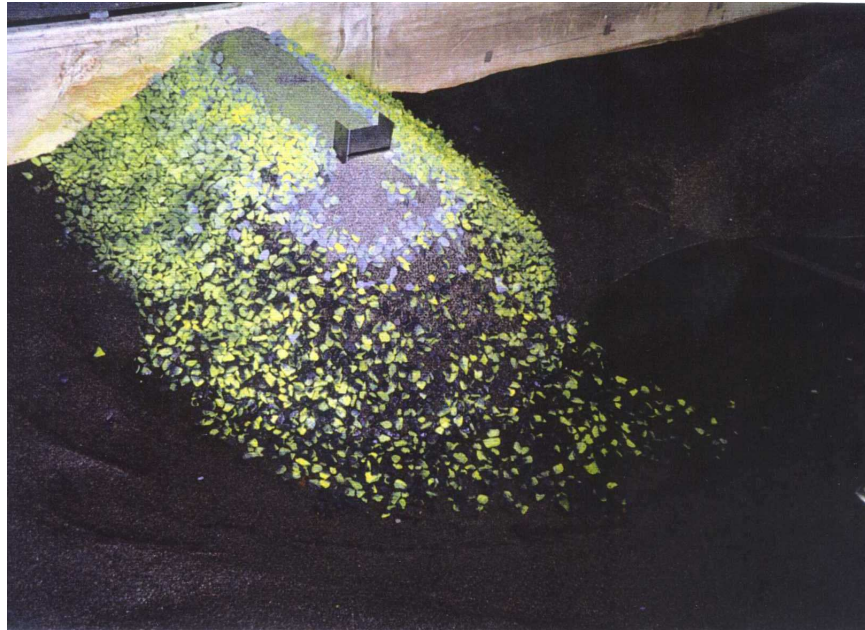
Failure of riprap on an abutment in a laboratory experiment (Eve, 2000).
